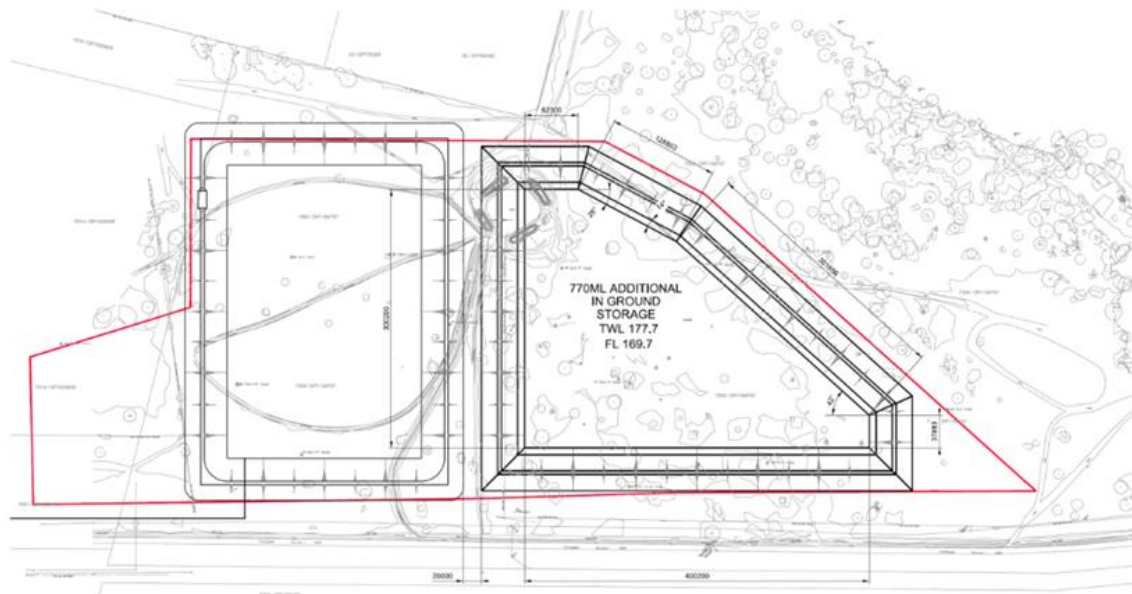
Locality Plan of Storage 1a (Source Public Works)
